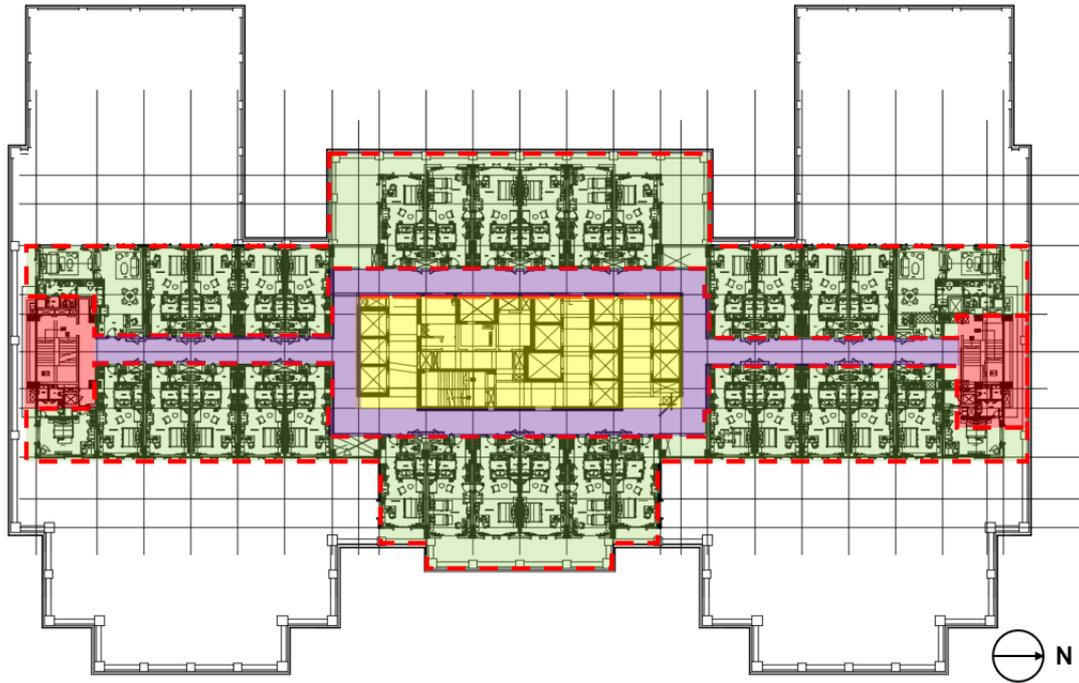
Typical Floor Plan, ITC Royal Bengal, Kolkata
